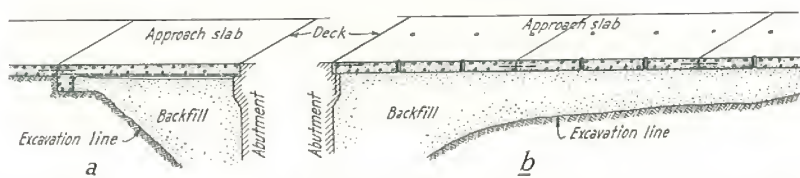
Two methods used in building approach slabs. The slab in type *a* is self-supporting and will not settle with the backfill. The slab in type *b* does settle with the fill, but provisions may be made for jacking up the slab again.
